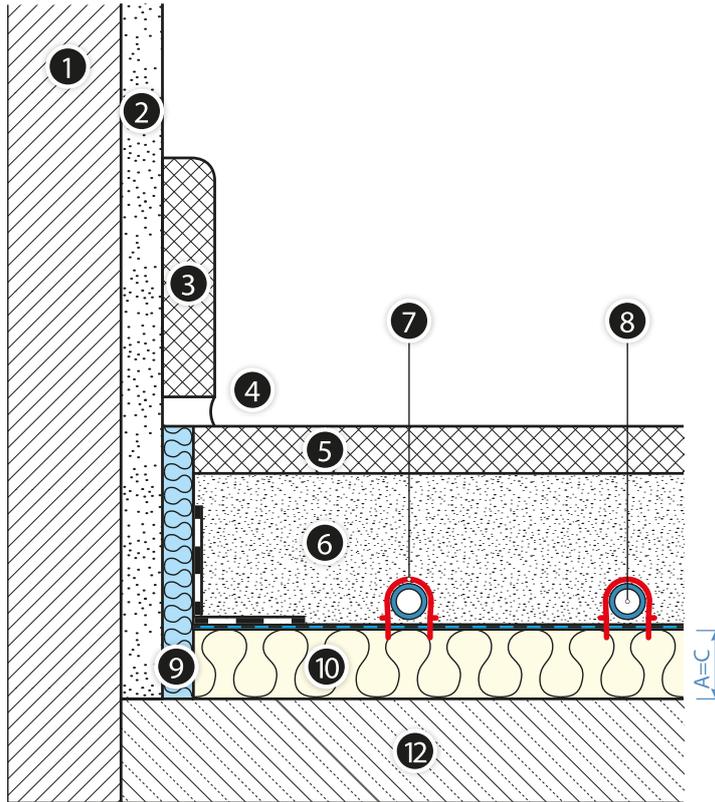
Floor heater with KAN-therm Tacker System board and supplementary insulation on the ceiling above internal not heated room and on the ceiling in contact with outside air
